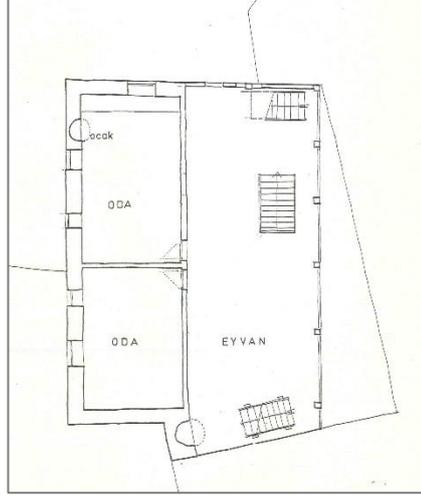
Plan type with rooms on one side of open sofa – 2794-25 (Source: Kirayođlu Archive)
